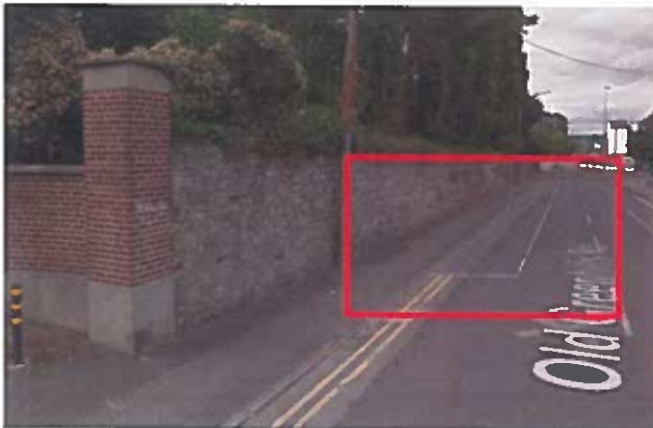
The proposed vehicular entrance would cause the loss of on street car parking
